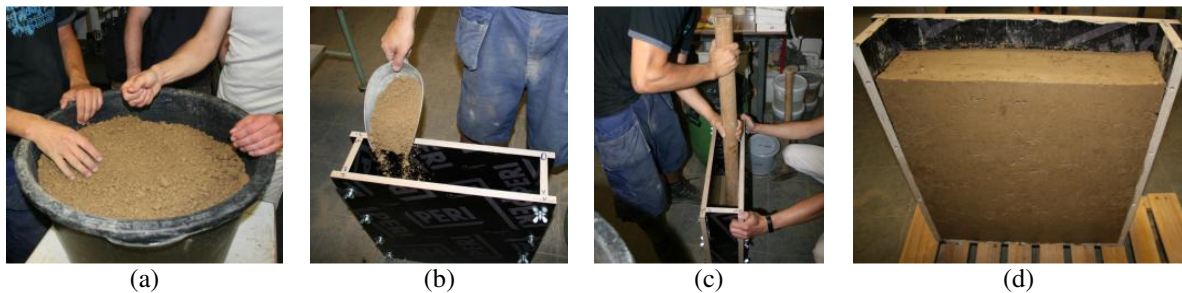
Manufacturing of the rammed earth wallets [16]: (a) earth mixture; (b) filling of the formwork with one layer; (c) compaction of the layer; (d) demoulding after compacting.
